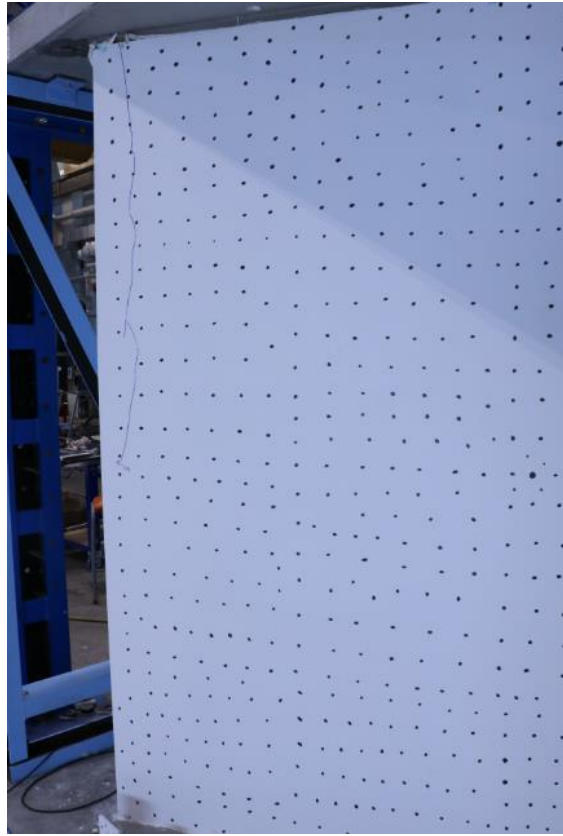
Specimen A1 - Step 14 — DS2: wallboard damage – location 6
